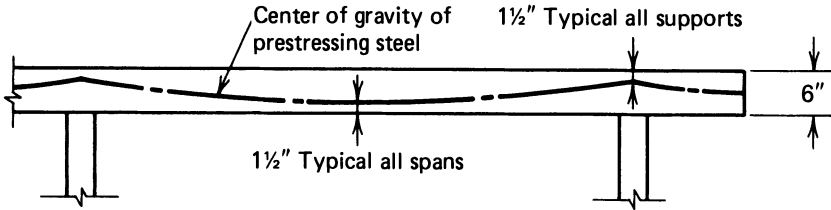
Tendon layout for 6 in. slab roof for building in Problem 6.
